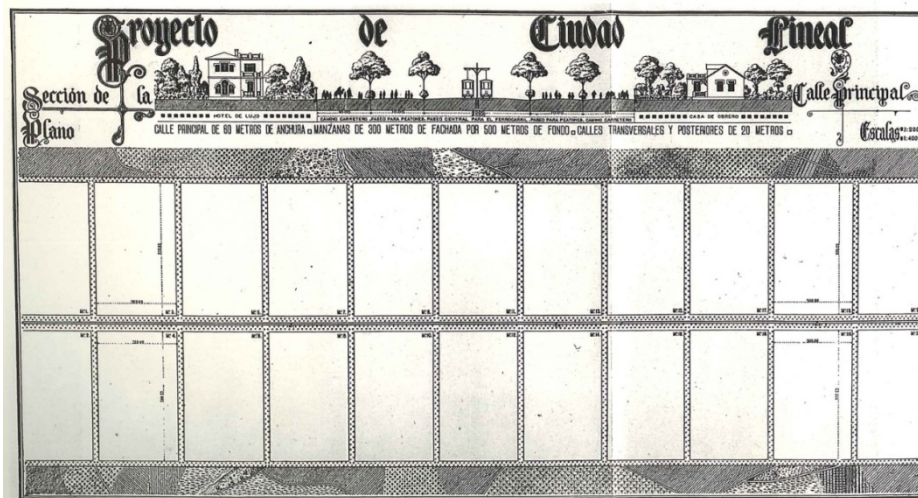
Plan and section of the Linear City Madrid, 1913(Jean Dethier, 1994)
